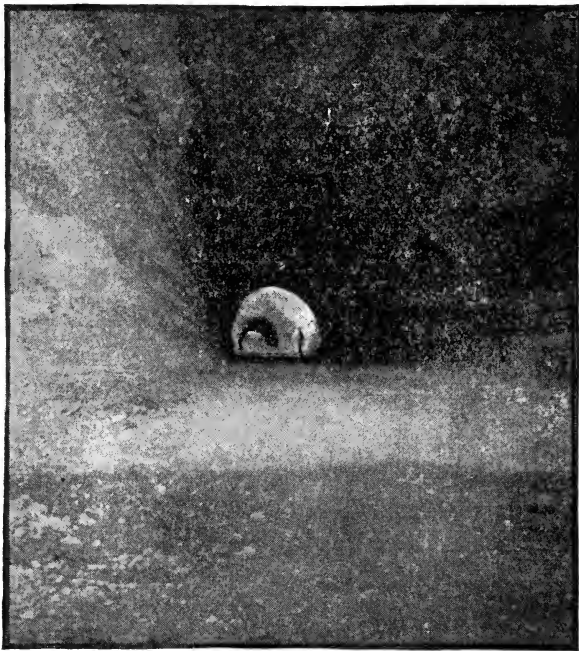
FIG. II.—TURLOCK CANAL. VIEW IN TUNNEL.
